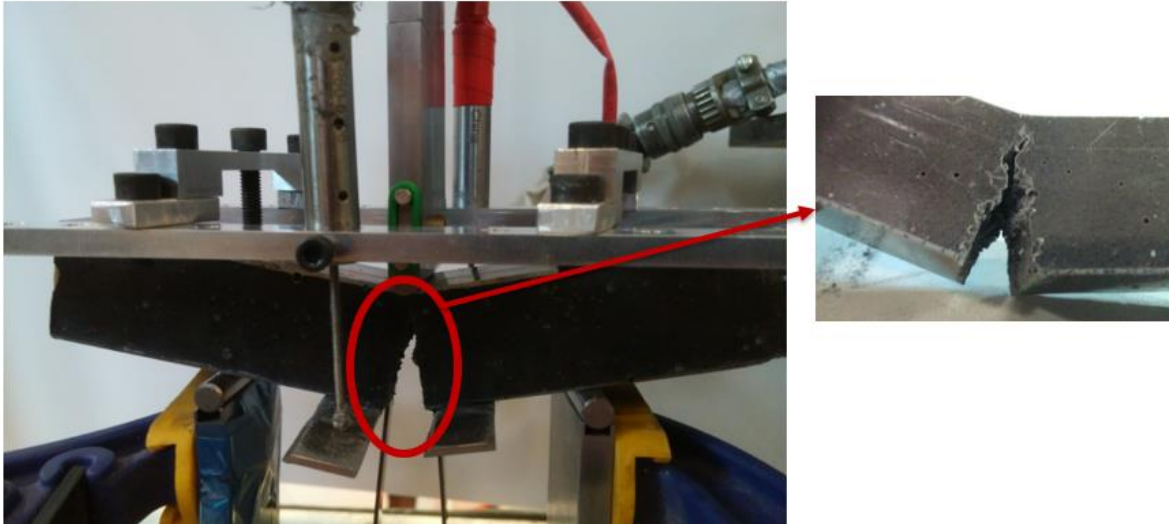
Modified fracture toughness test setup per ACI446 used to capture all tests.
